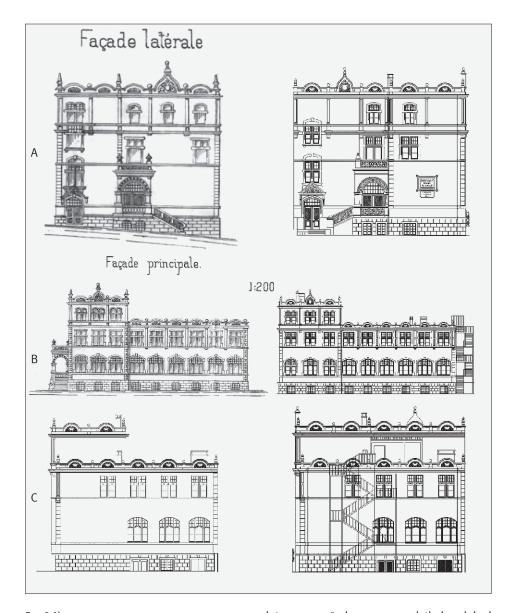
A) THE NORTHERN FAÇADE IN THE ORIGINAL DRAWINGS OF 1904 AT THE LEFT AND THE CURRENT RESTORATION FAÇADE AT THE RIGHT;
